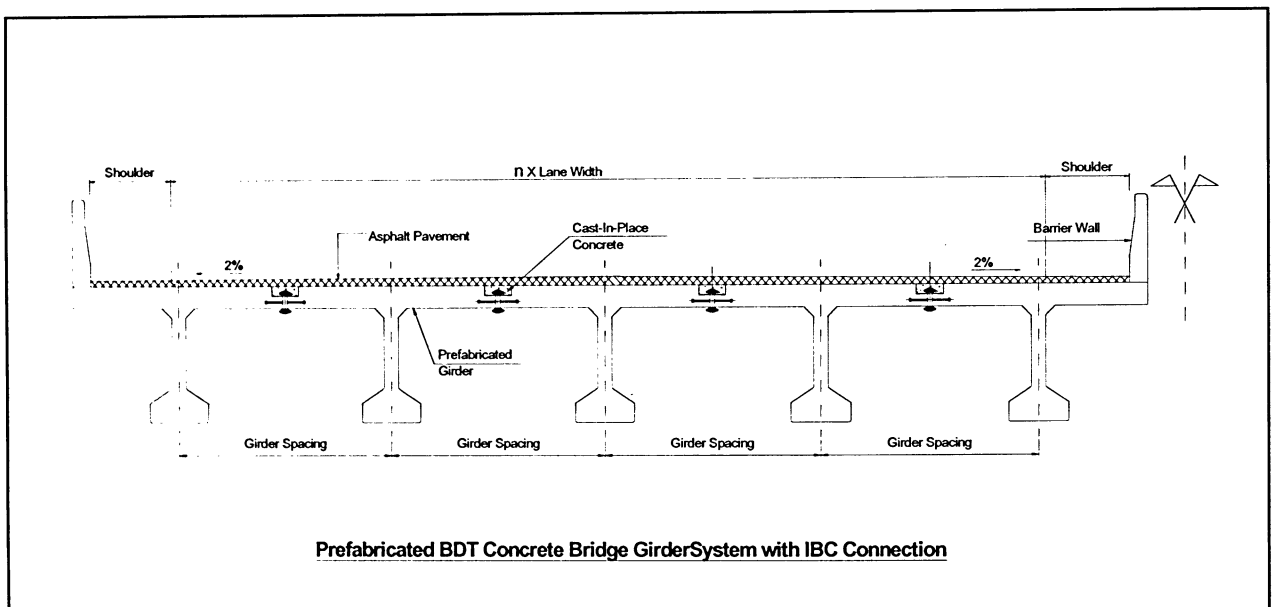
Cross-Section of Prefabricated DBT Bridge Girder System with IBC Connection
